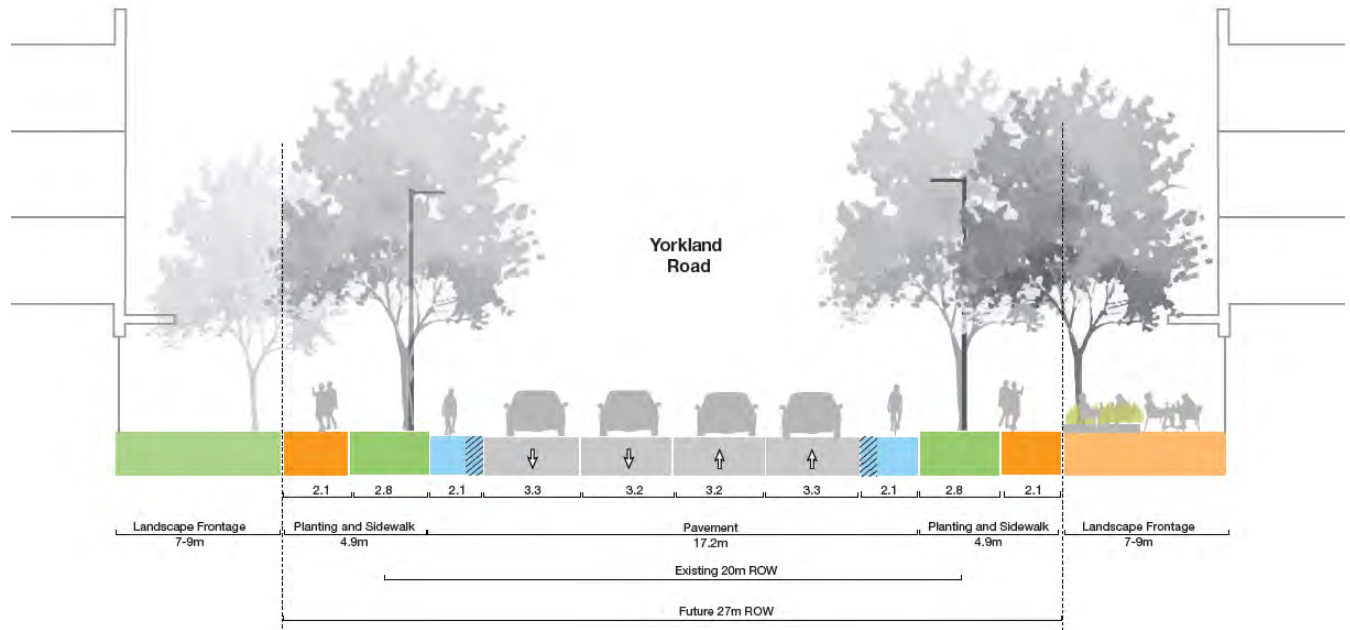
Yorkland Road Preferred Long-term Cross-Section
